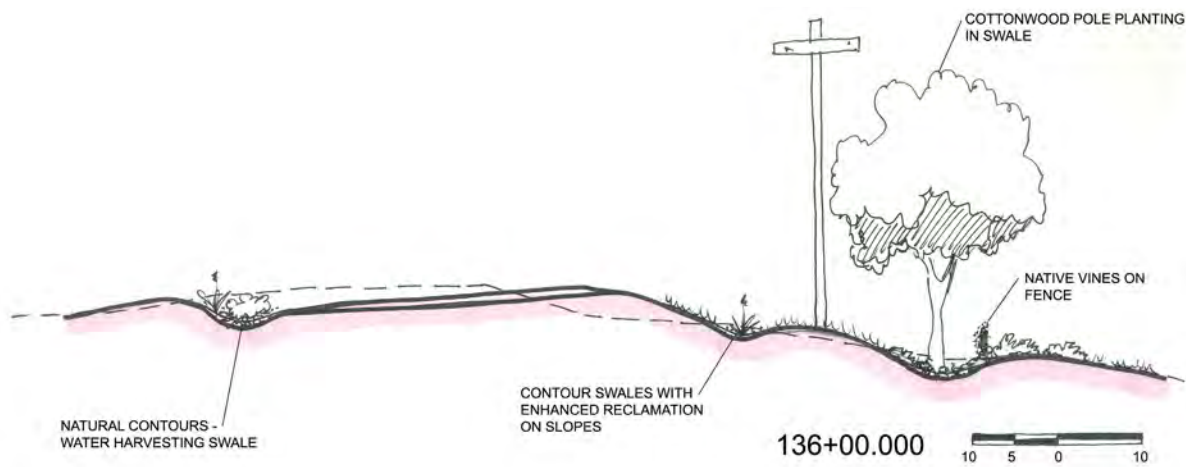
Sectional view of infrastructure and utilities (Sites Southwest Ltd.)
